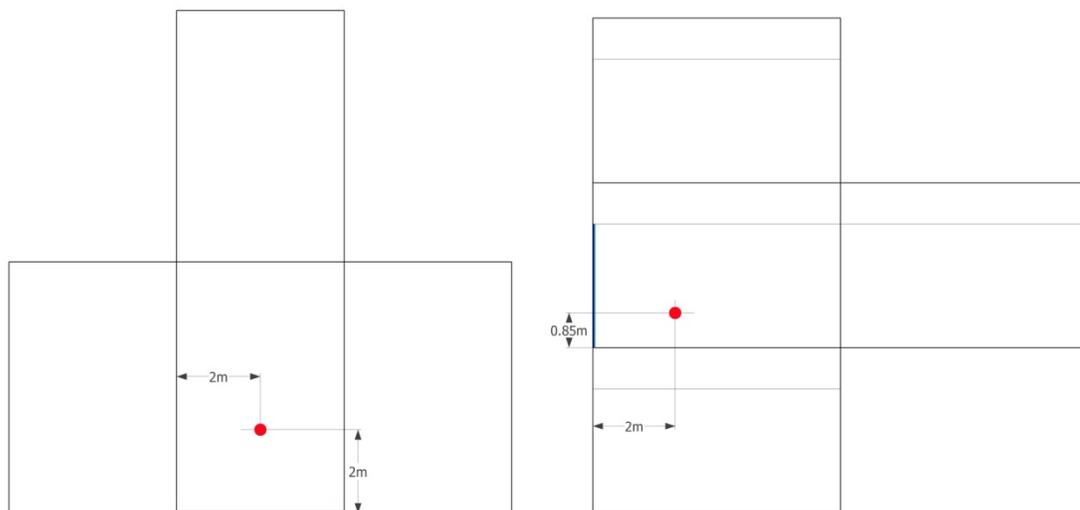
Plan (left) and side elevation (right) of lighting sensor at 2m from window
